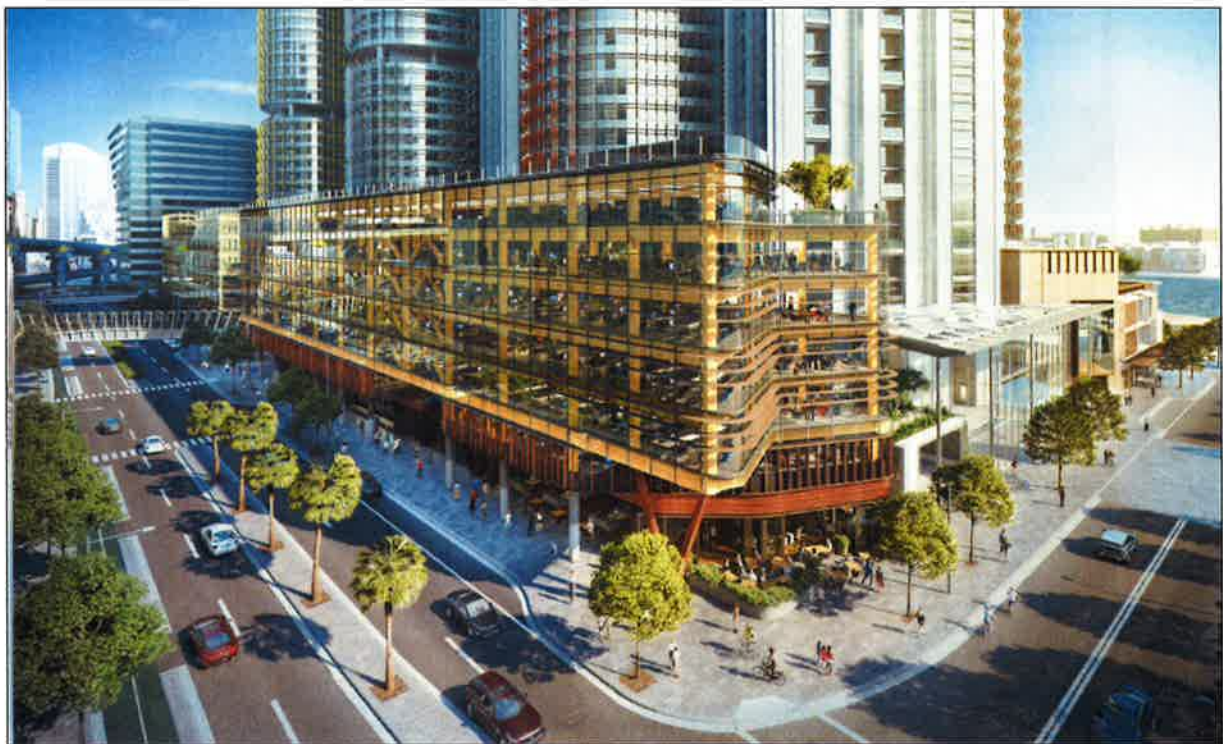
| Photomontage view of Building C1 from the north-east (Source: Applicant)
